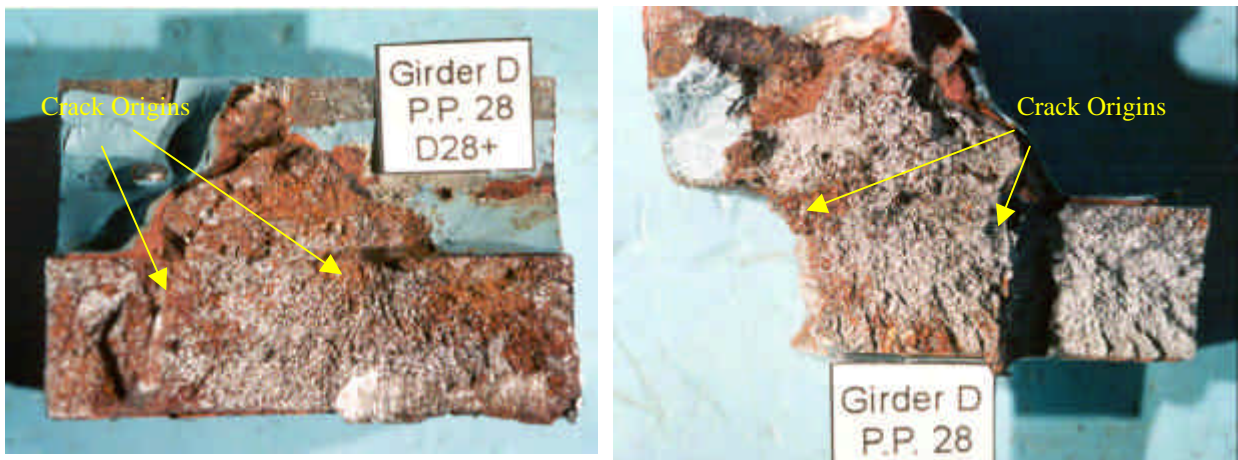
Opposing Crack Surfaces at the Shelf Plate Weld Termination Fracture Origin
